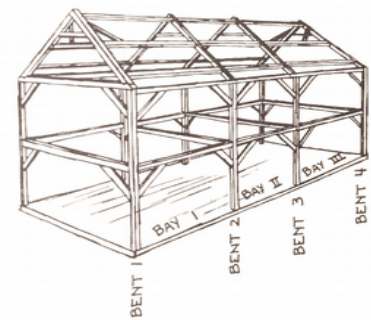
The Timber Frame: A typical timber framed structure illustrating the difference between bents and bays. (Source: Ted Benson & James Gruber's, *Building the Timber Frame House*, pg. 15)
